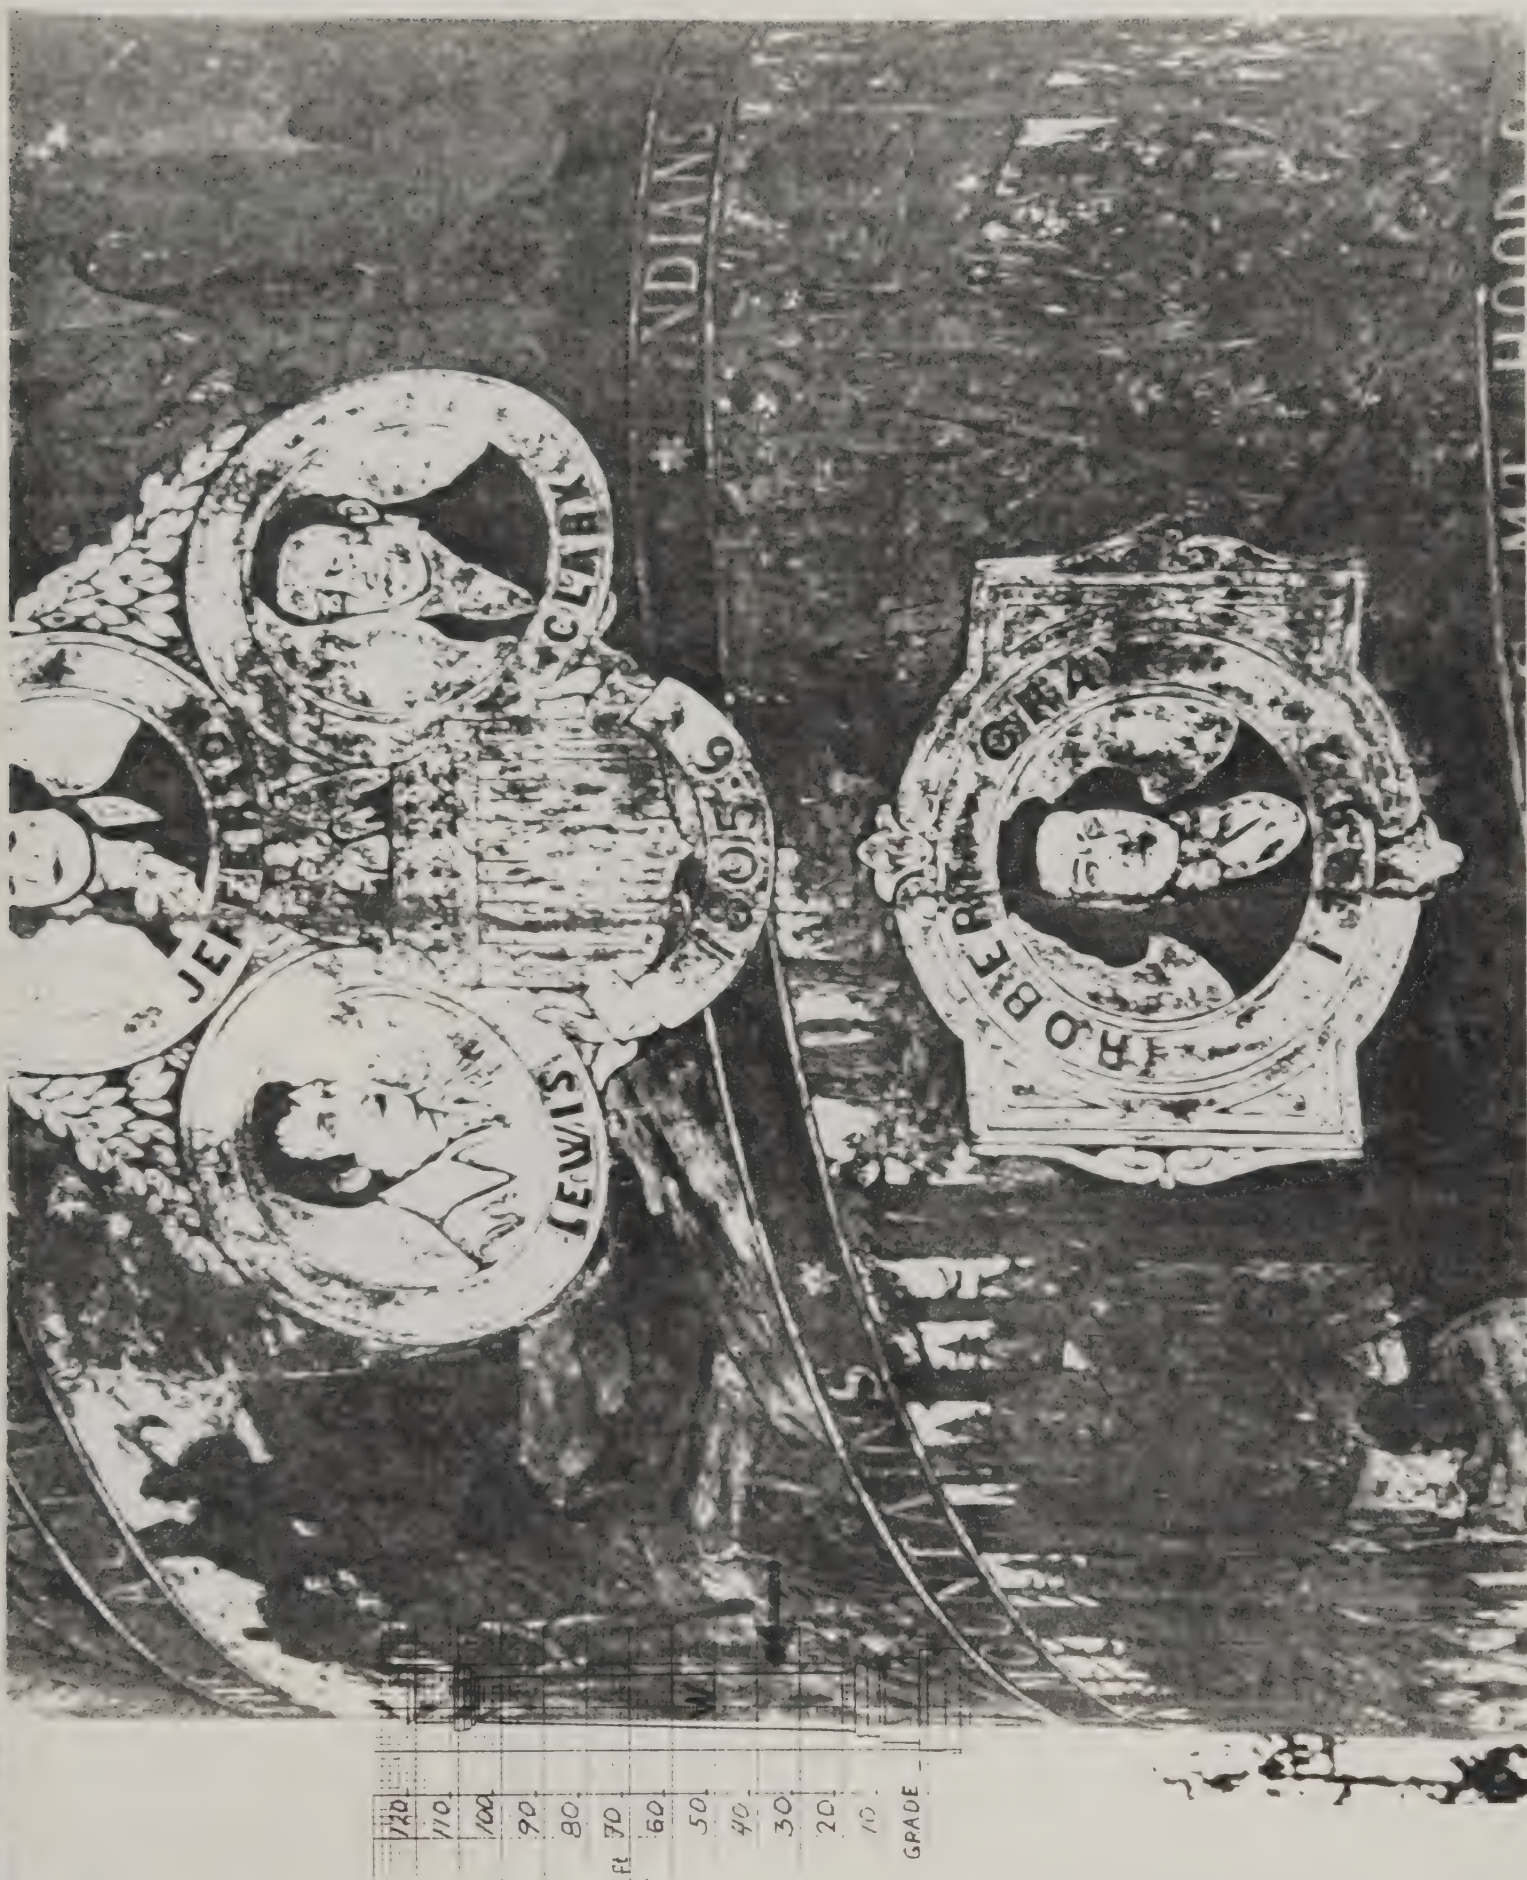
Photo Astoria Column West Face Section-JAN 1989
